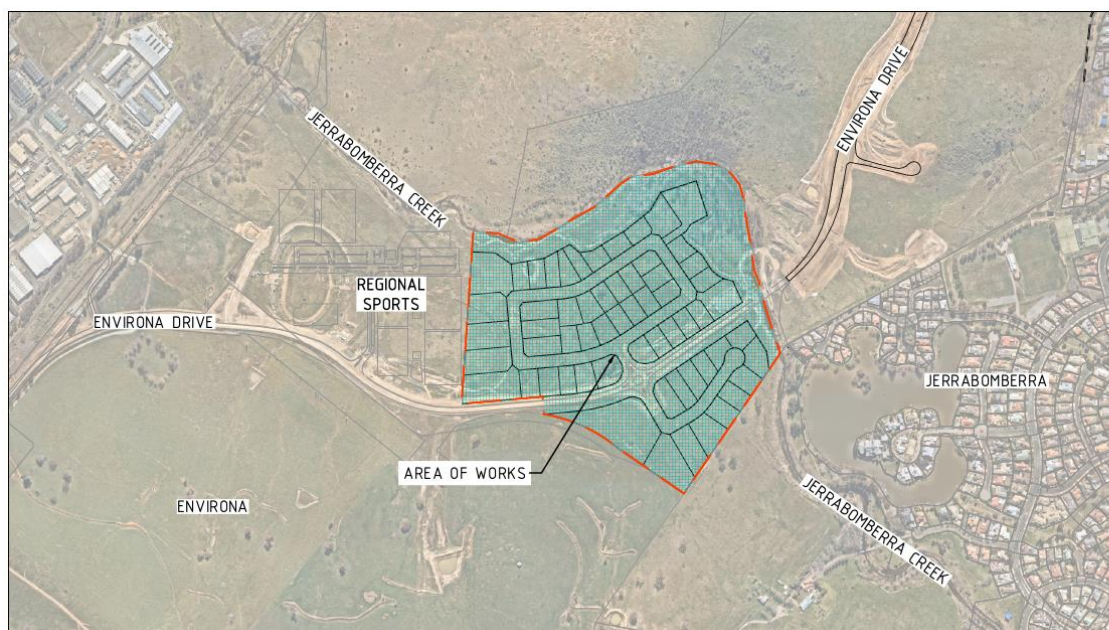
Locality plan indicating site and works area (Prepared by Spiire)
